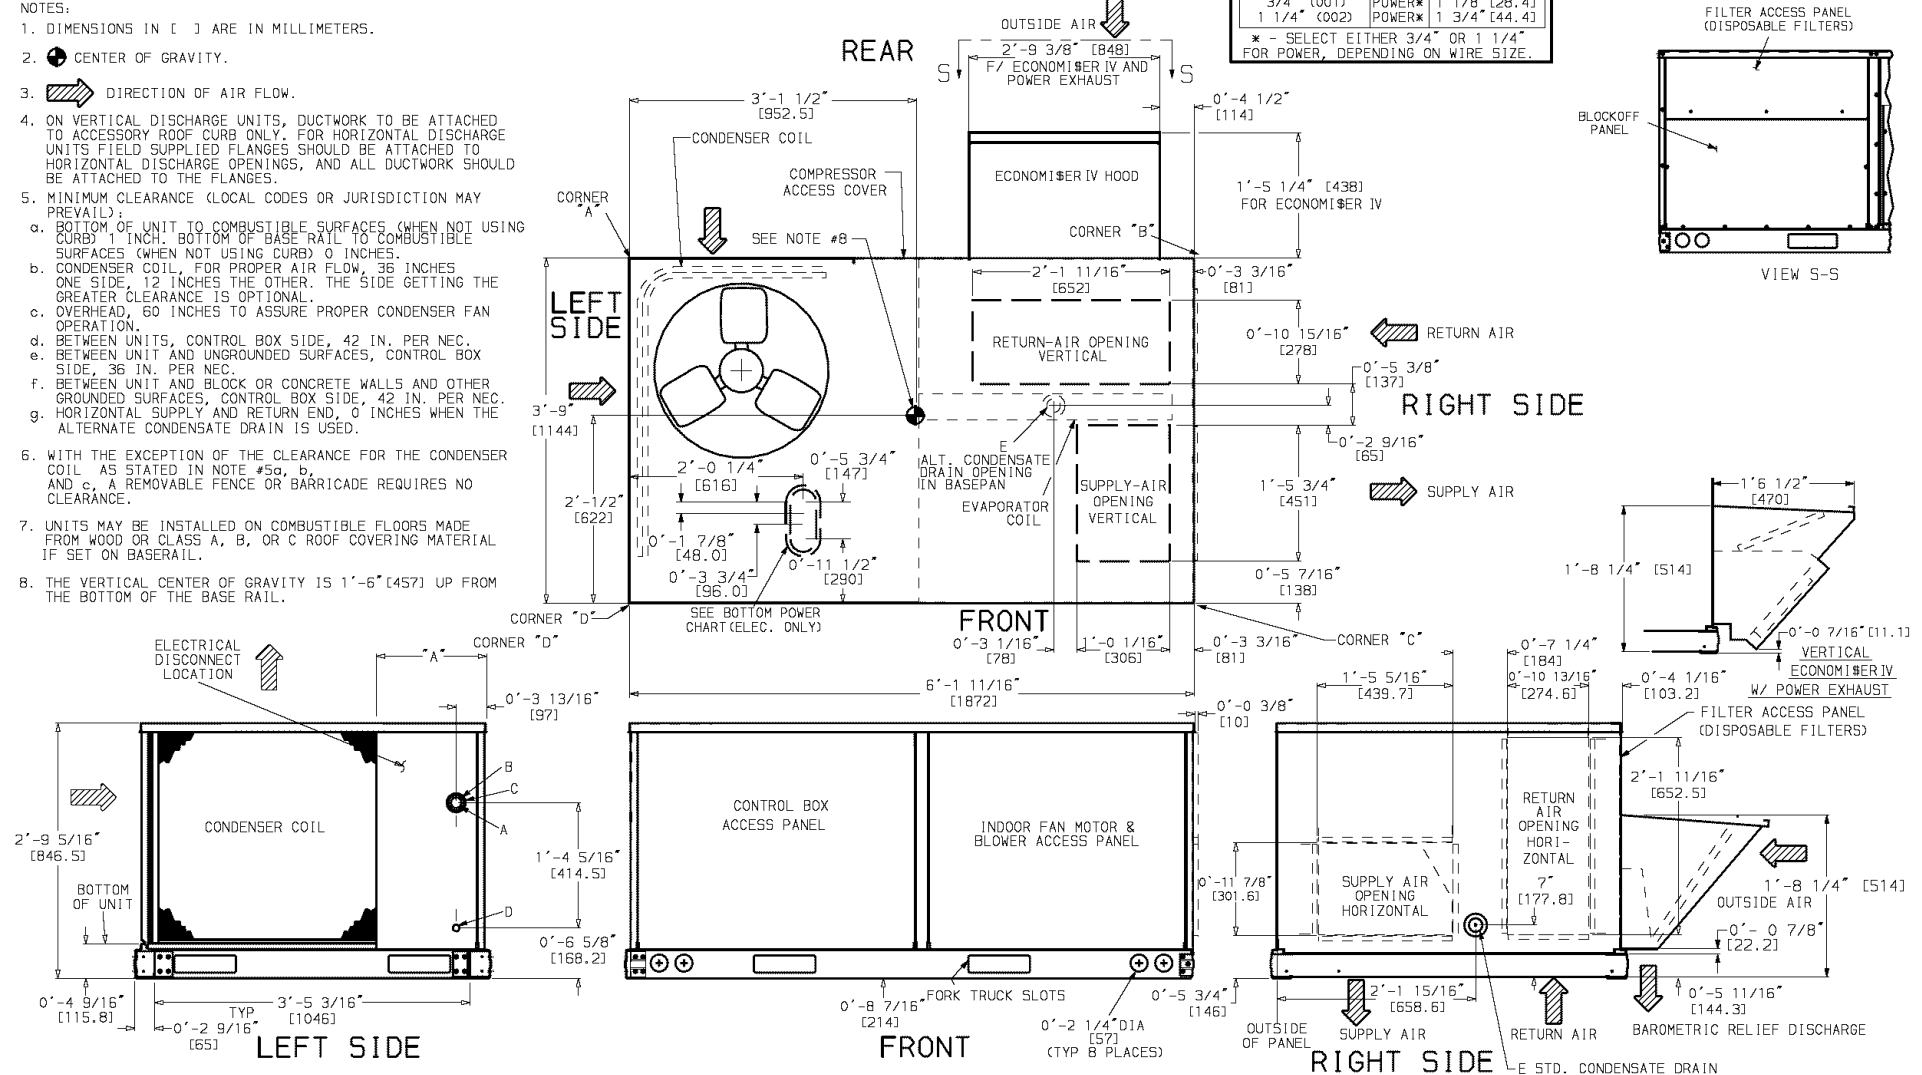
A — Base Unit Dimensions — 50TFF004-007 and 50TM004-006 Units
